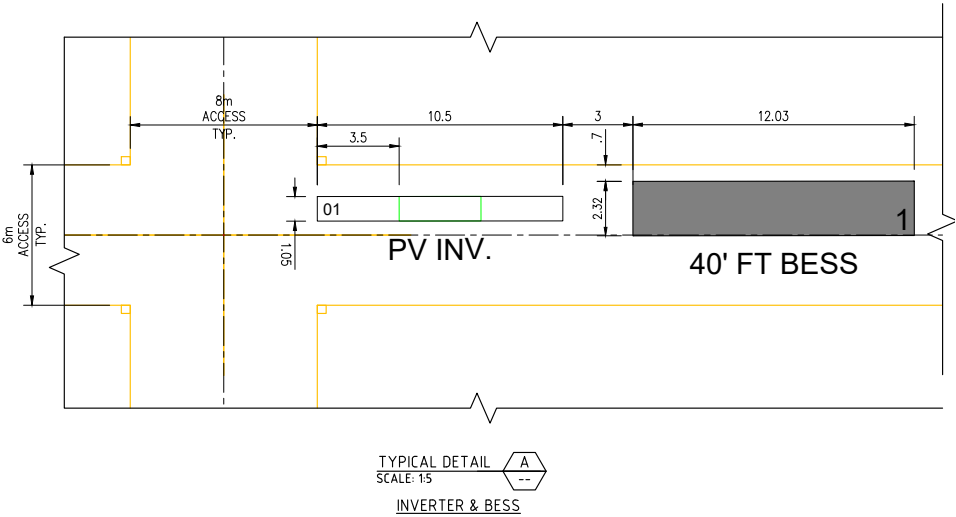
PROPOSED SITE LAYOUT OF MODIFIED DEVELOPMENT – DISTRIBUTED BESS OPTION
